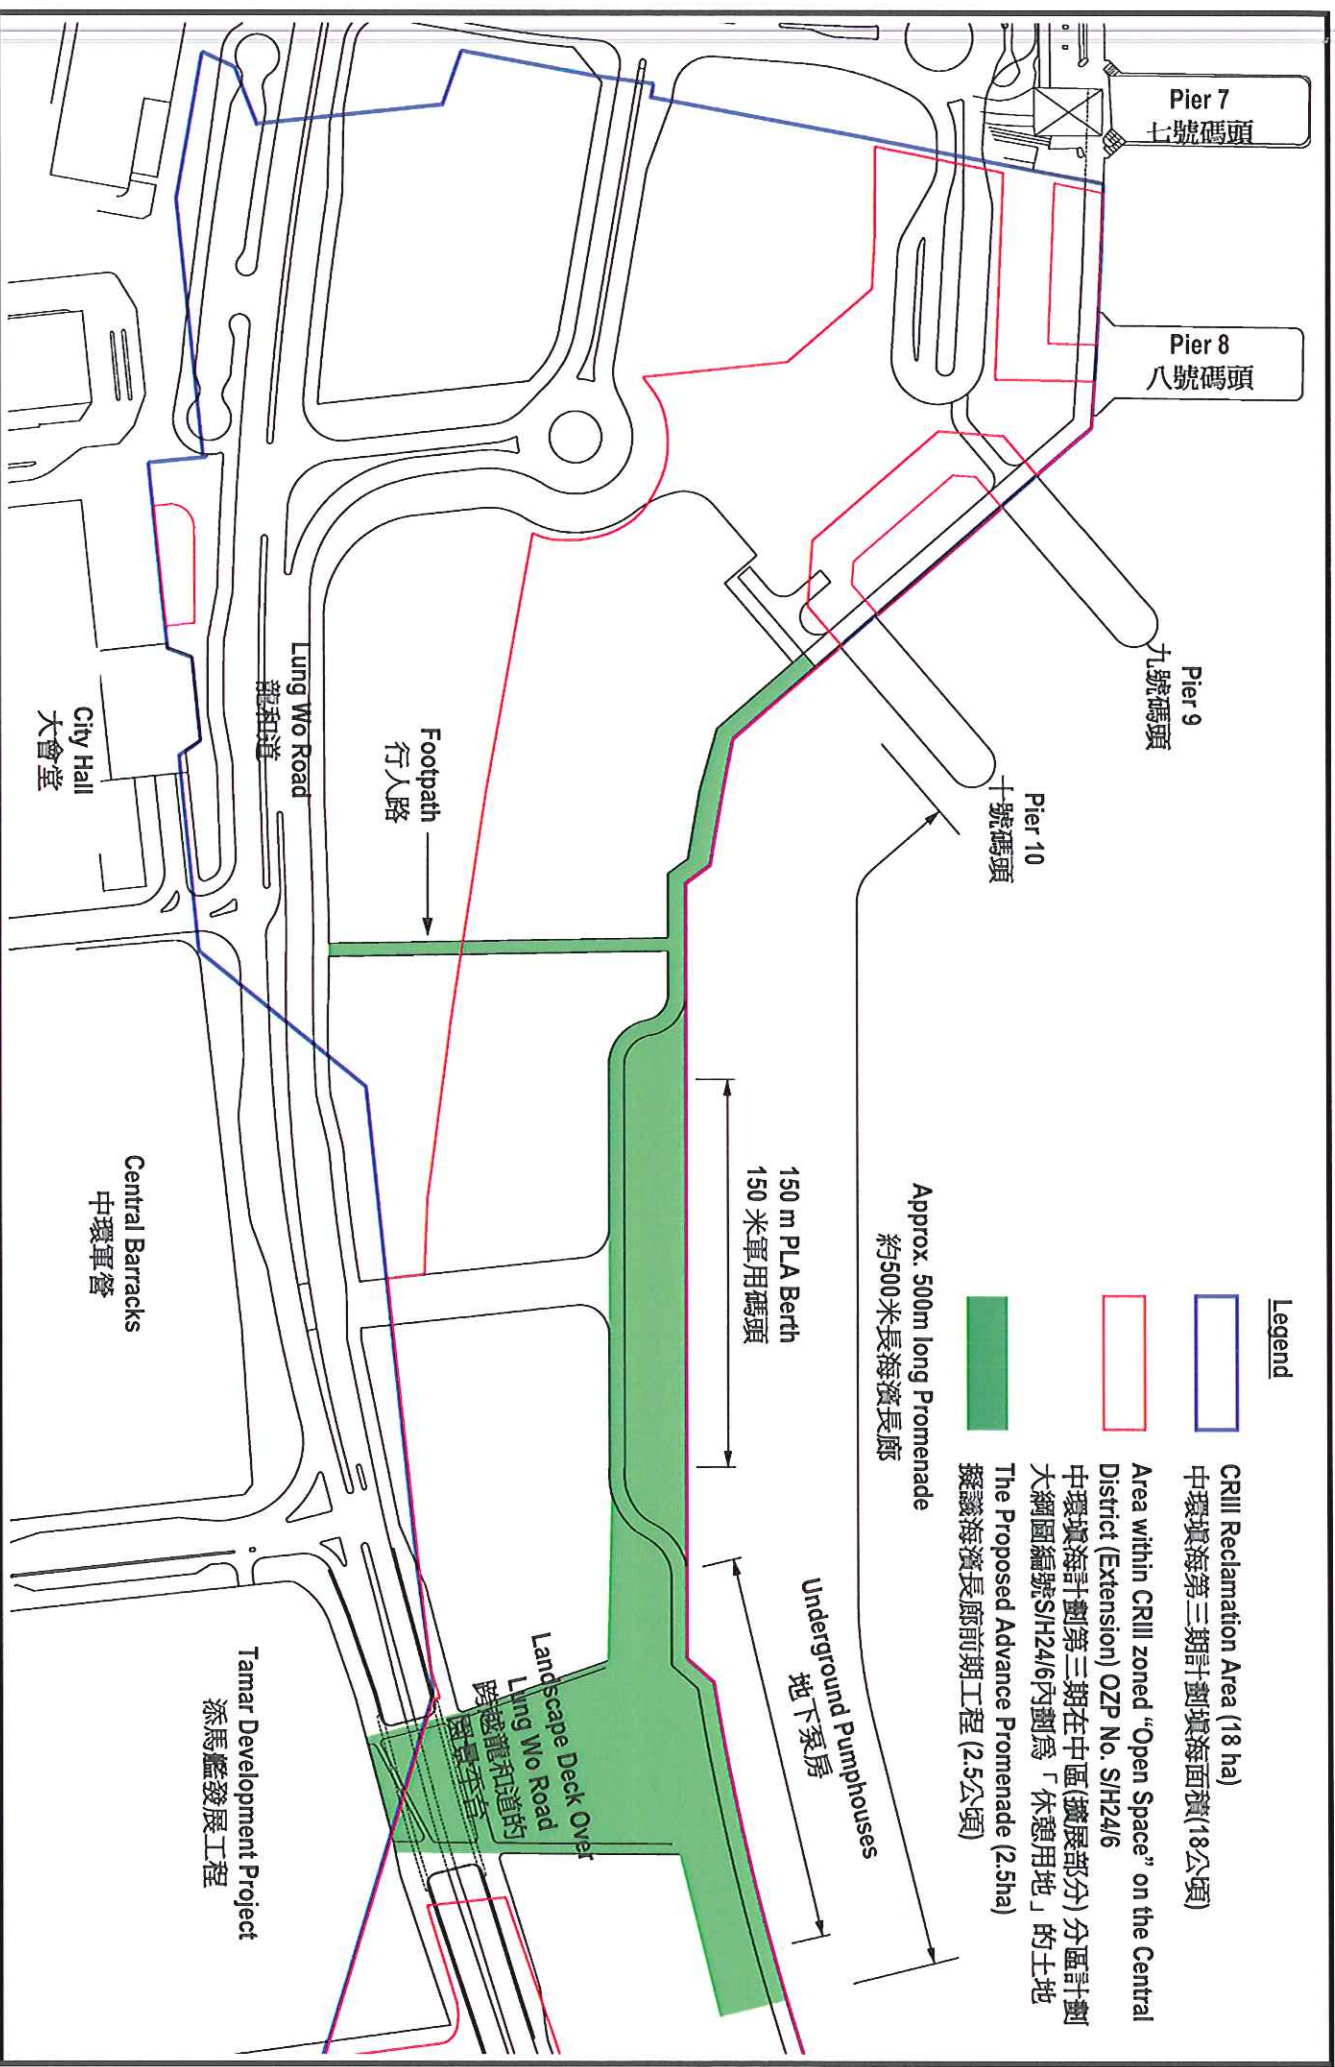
Layout Plan for the Advance Promenade Works (1)
